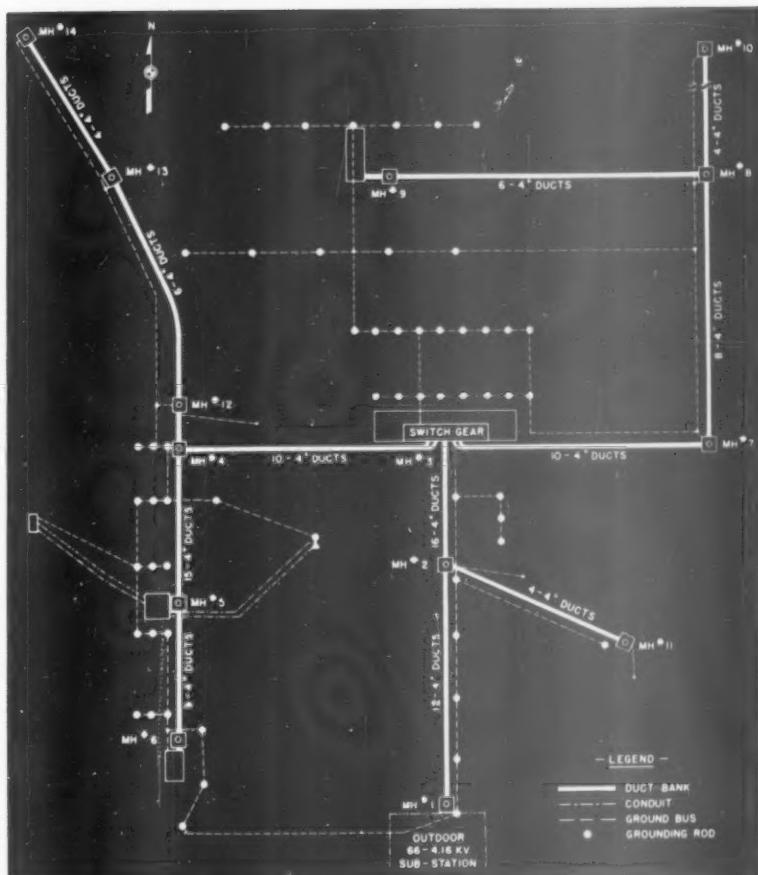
Underground cable duct for 4160 volt power distribution system and plan of plant grounding bus
